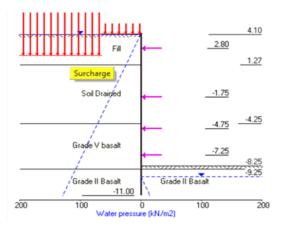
Typical Construction stage model for Normal Case in Wallap
